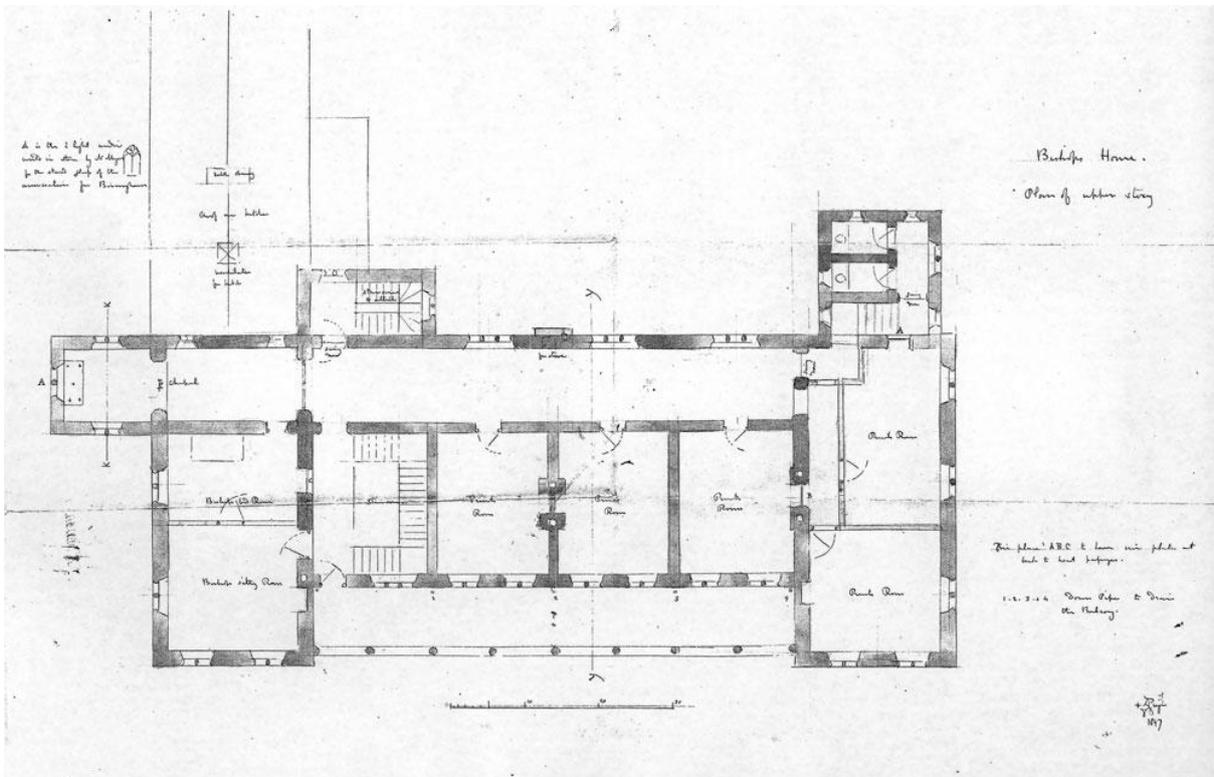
First floor plan (Courtesy: Peter Cheney)
